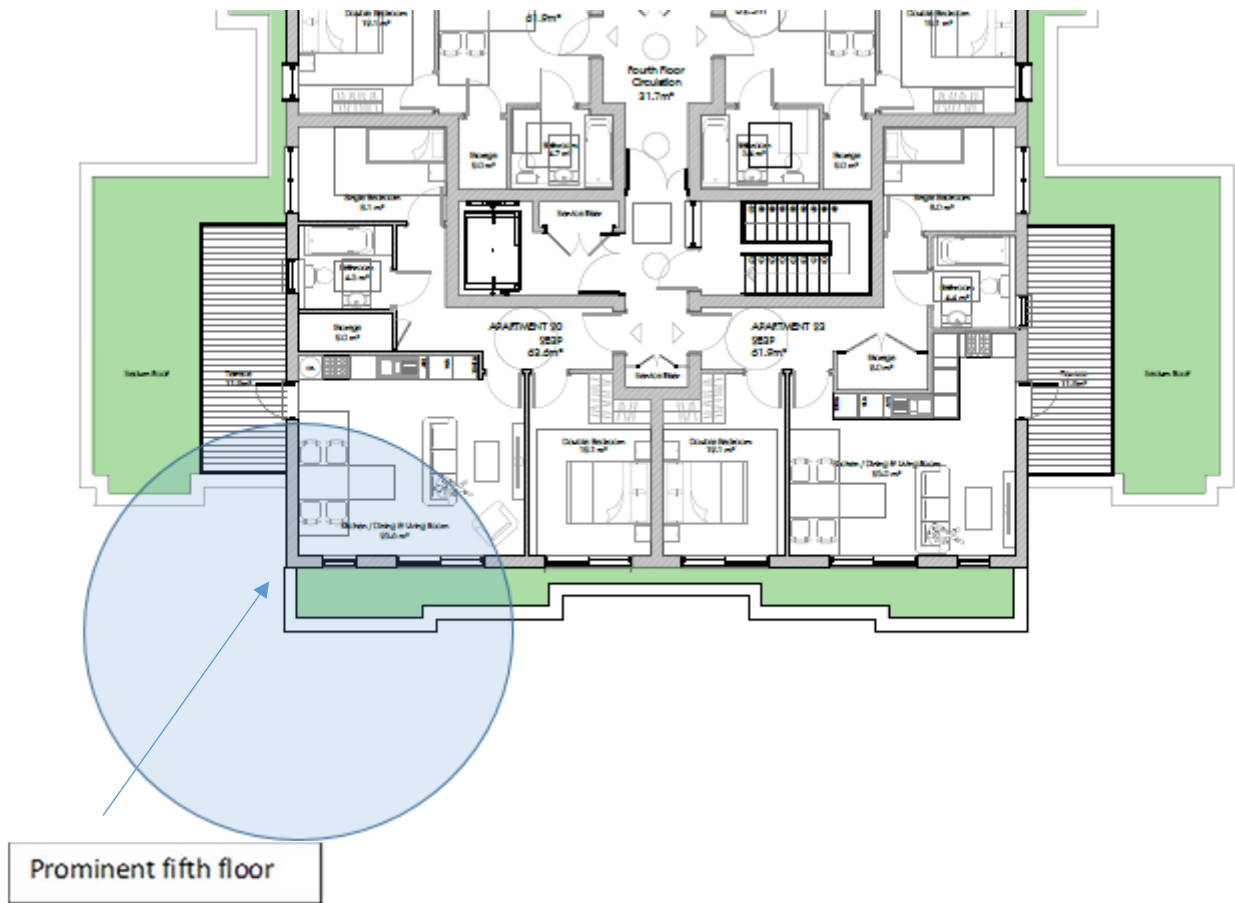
Where surrounding buildings are predominantly detached dwellings of two (2) or more storeys, new developments may be three (3) storeys with an additional floor contained within the roof space or set back from the building envelope below.
